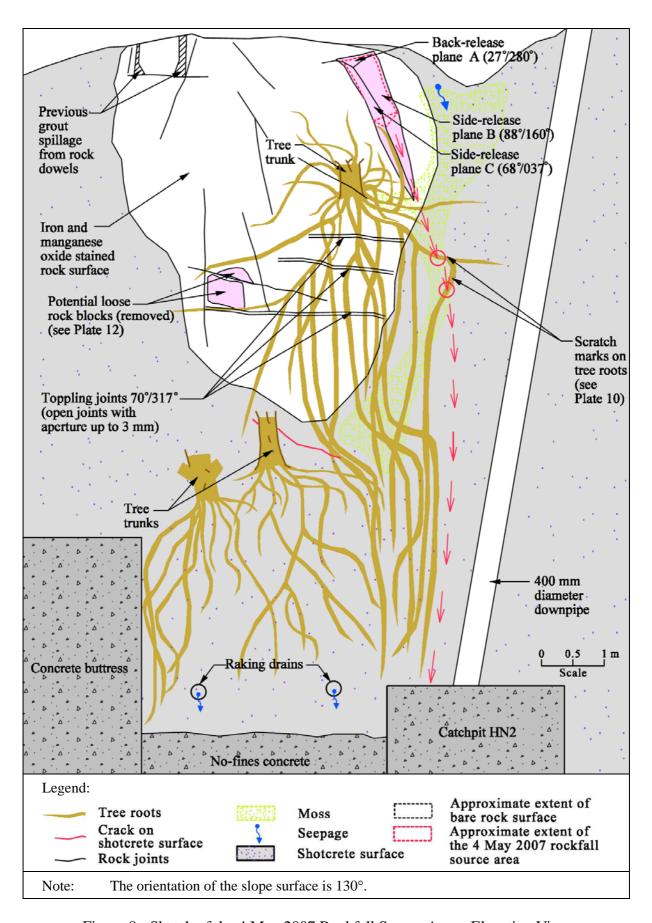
Sketch of the 4 May 2007 Rockfall Source Area - Elevation View
